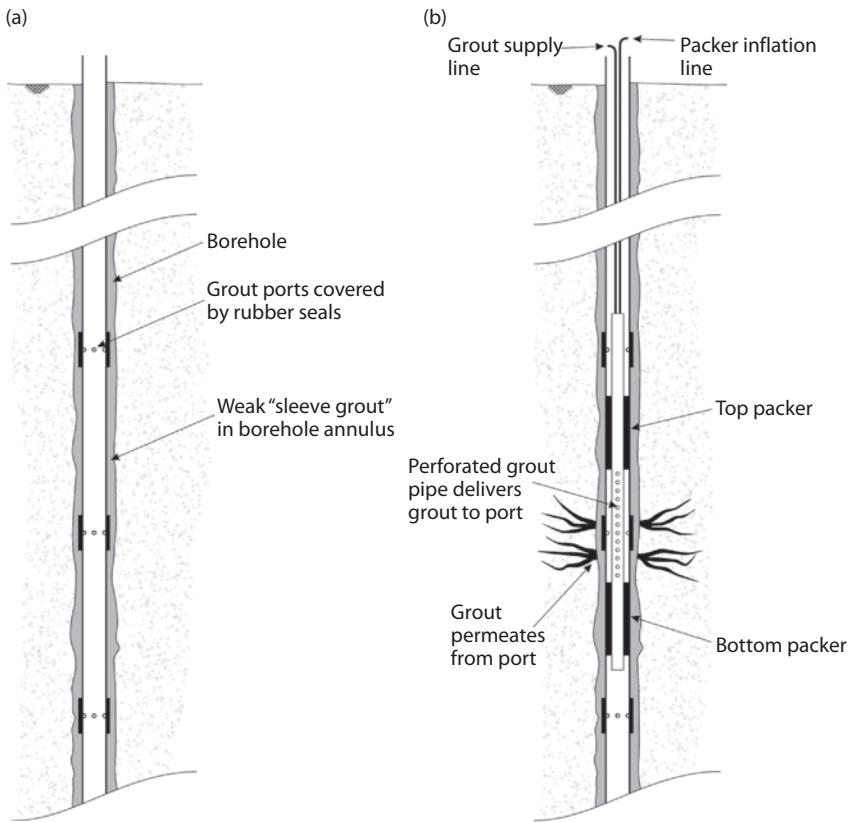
Grouting using TAM. (a) TAM pipe installed in a borehole. (b) Grout injected via double packer inside a TAM pipe.
